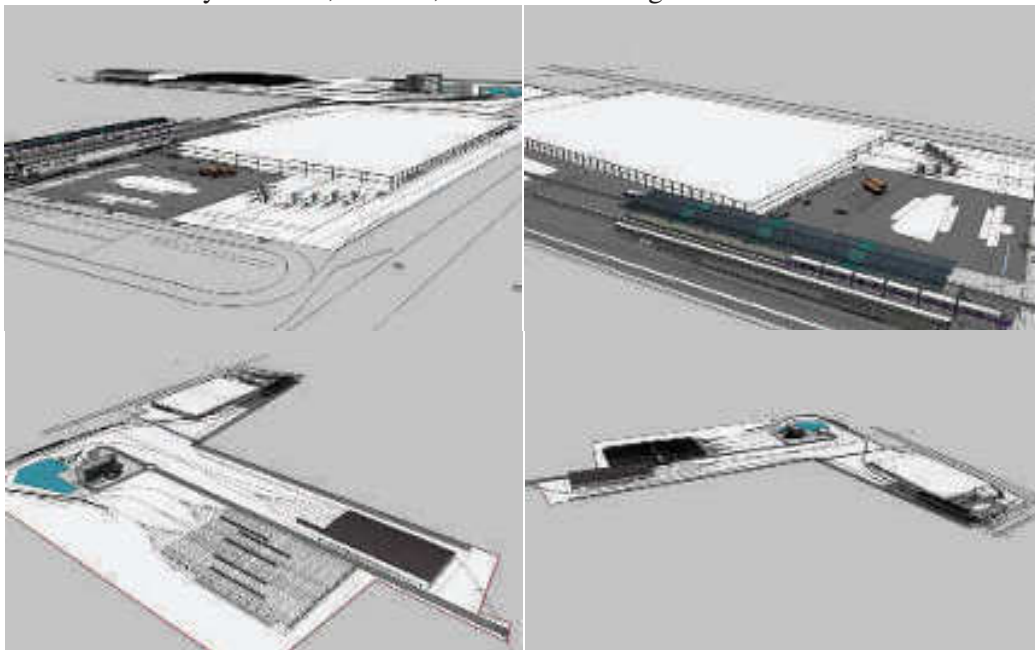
Design concepts of Depot and Park & Ride Building at Rom Klao Intersection
